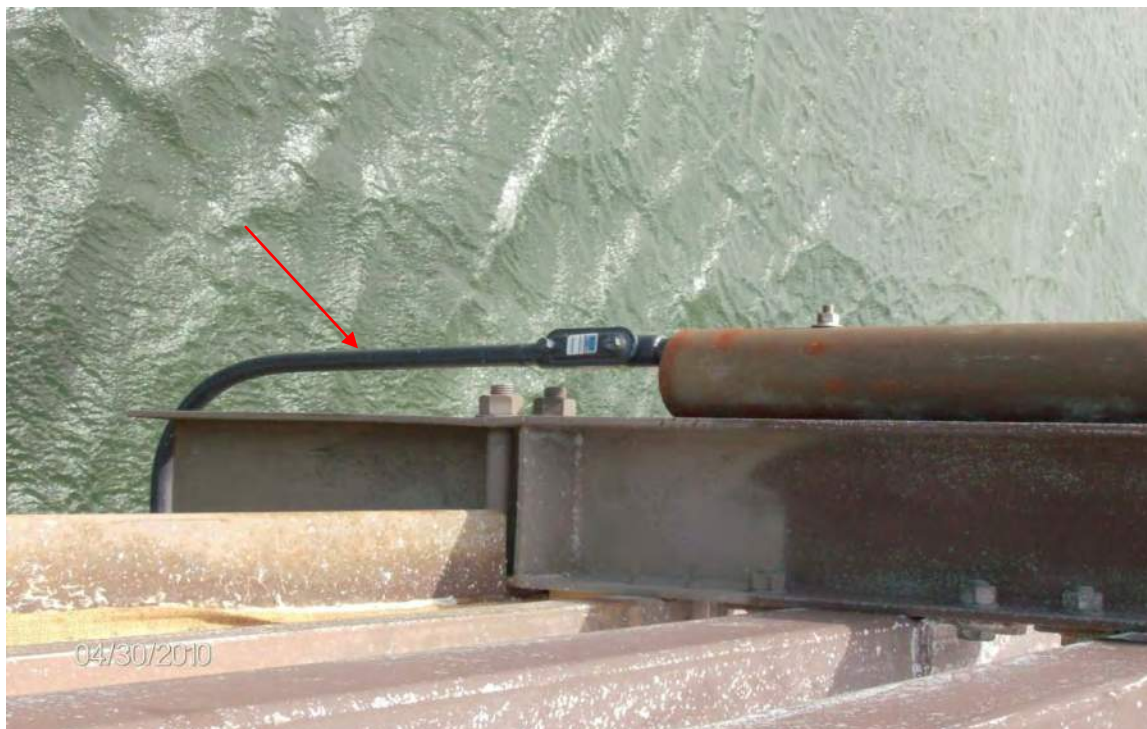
, Showing the new conduit system at the south approach traffic lights.
